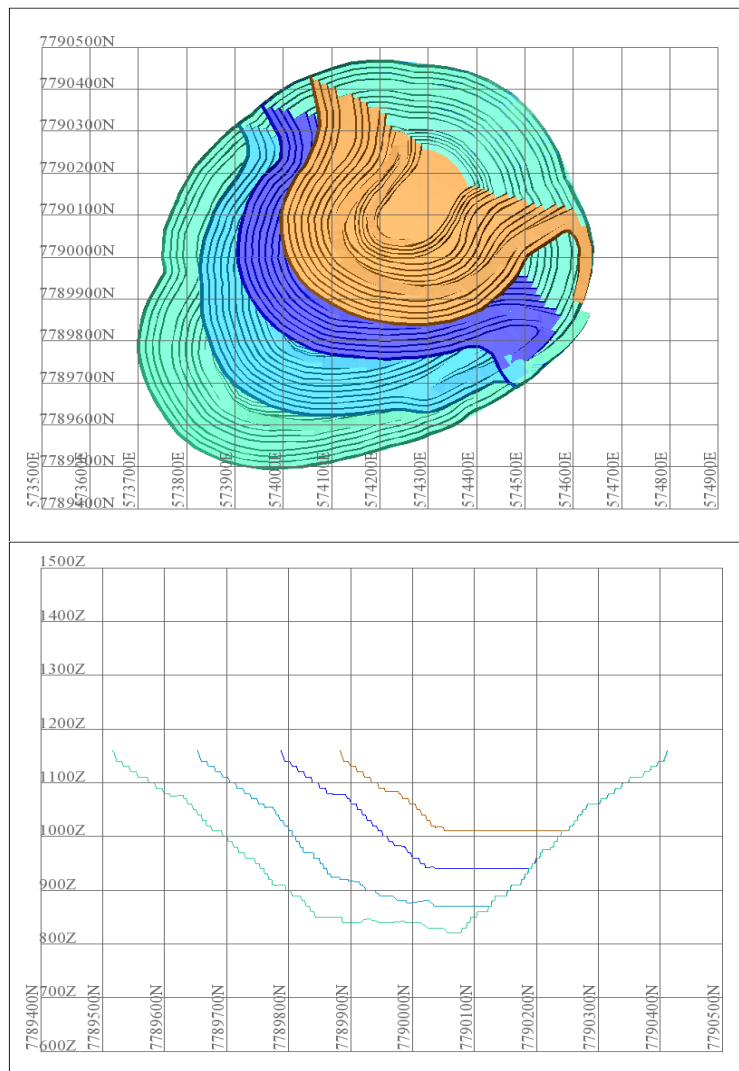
Dokwe North all stages plan view (top) and long-section (north-east to south-west) view (bottom).
